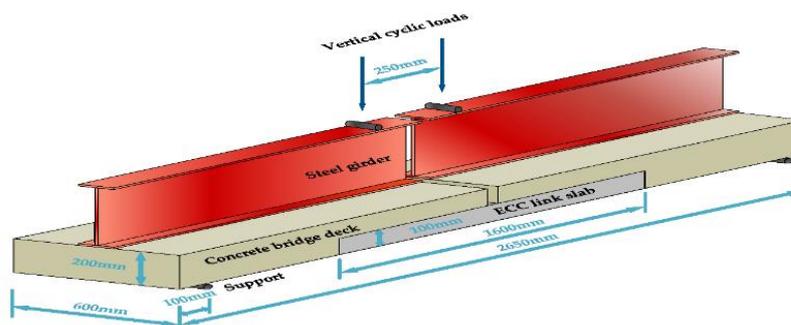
Vertical cycle load and its impact on concrete bridge deck considering ECC-link slab [3]
